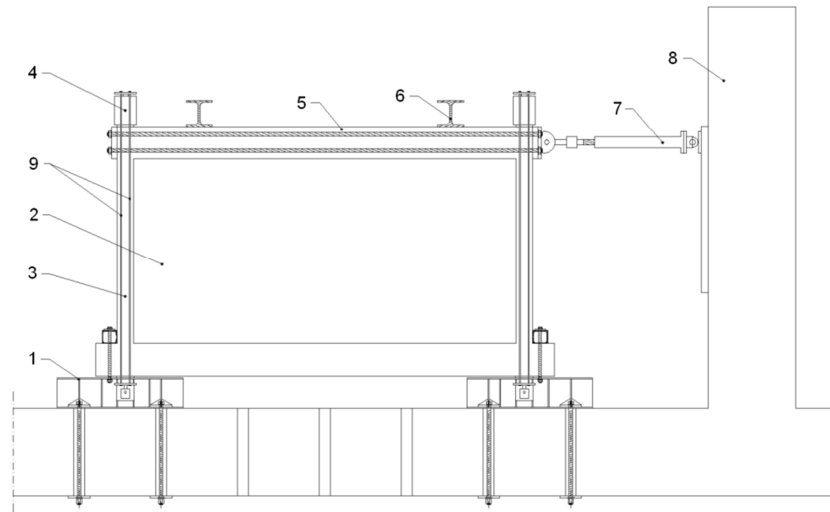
In plane setup. 1 – Metal support; 2 – Masonry panel; 3 – RC frame; 4 – Hydraulic jack which allows the transmission of the upper floor columns loads; 5 – Steel ties that allow the reversal of load; 6 – Cross beam to the RC frame; 7 – Horizontal actuator; 8 – Reaction wall; 9 – Reaction ties
